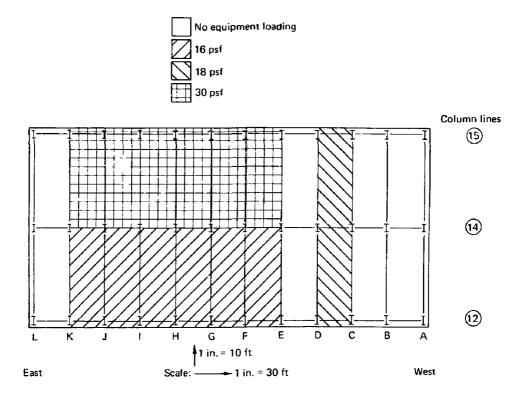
Second floor equipment loads (supplied by MFTF personnel).
